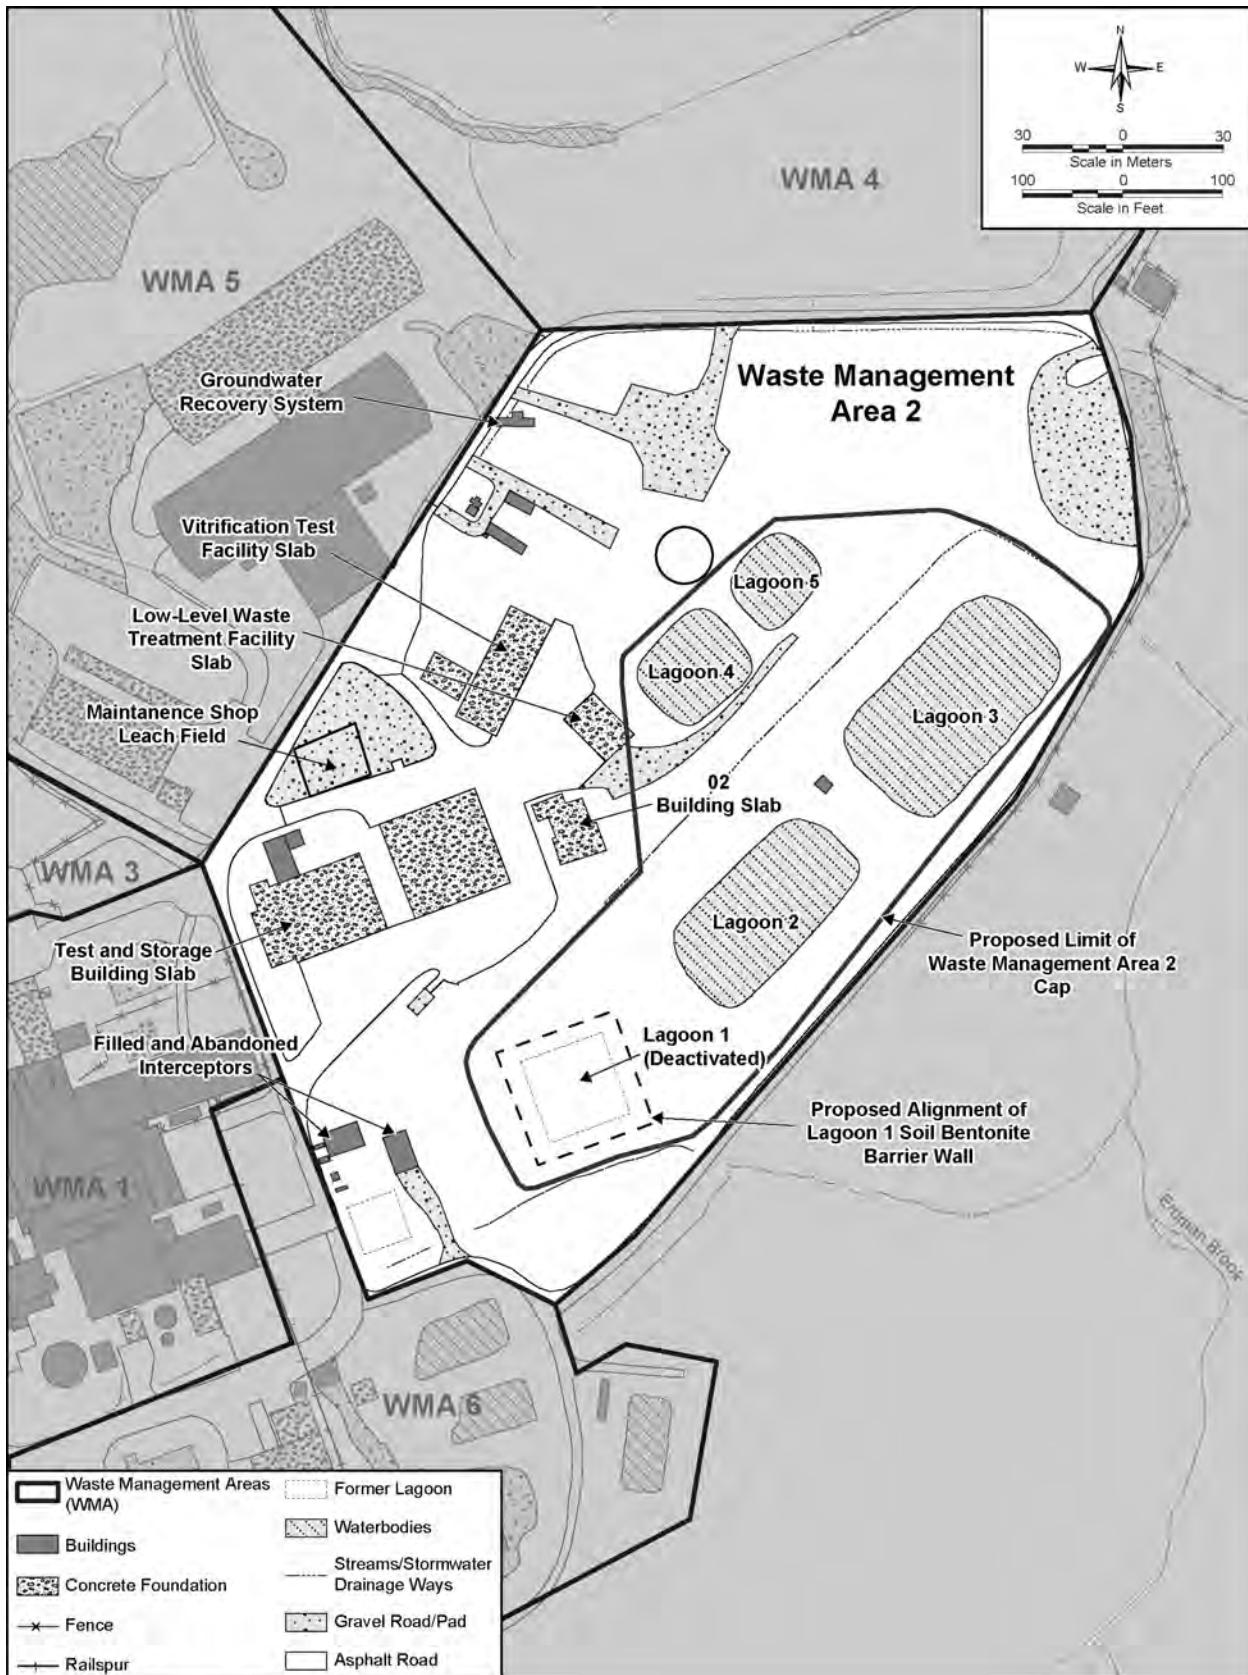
Plan View of Cap and Barrier Wall in Waste Management Area 2
